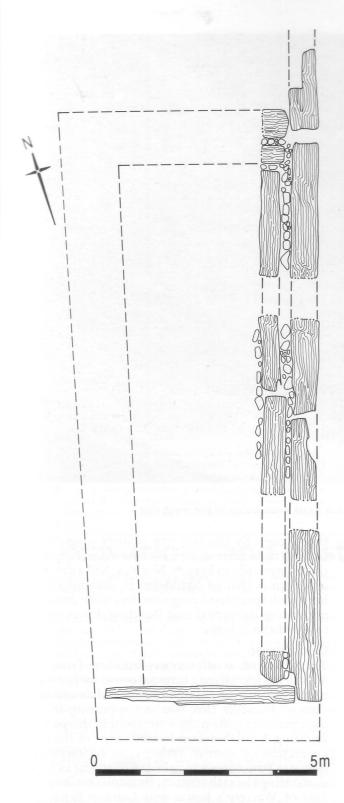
Plan of Building A (TEX88) showing excavated foundation of paired oak baulks which sealed the beech raft shown in Fig. 2: cf Fig 5. (S. Hurman)
